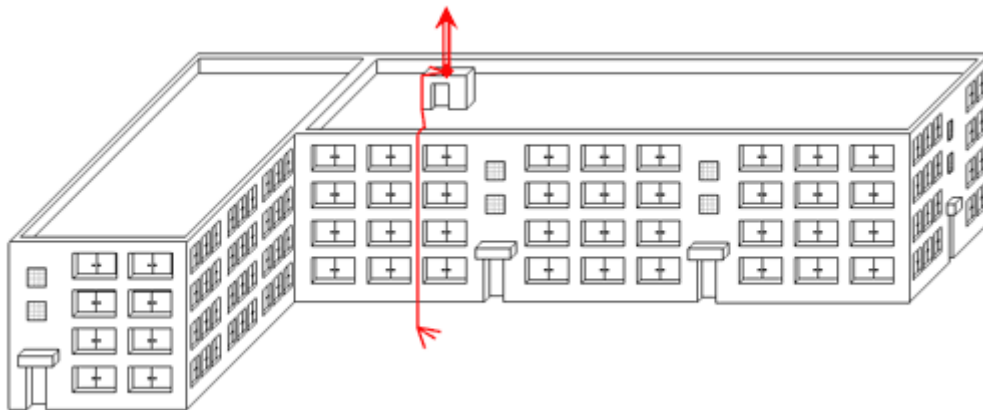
A school building installed with a single ESE lightning rod at the centre of the roof. (Source: GIMELEC)
